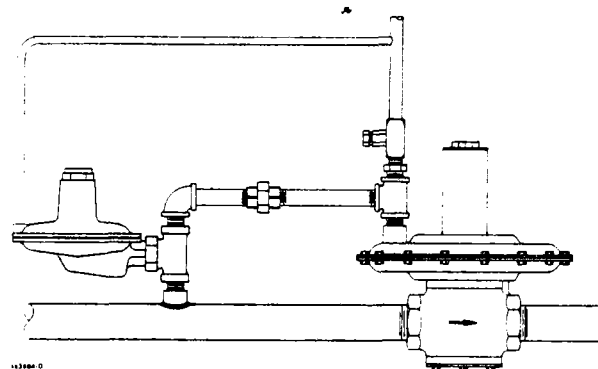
Typical Installation of a Type Y600 Used to Pressure Load a Type 66 Gas Regulator
